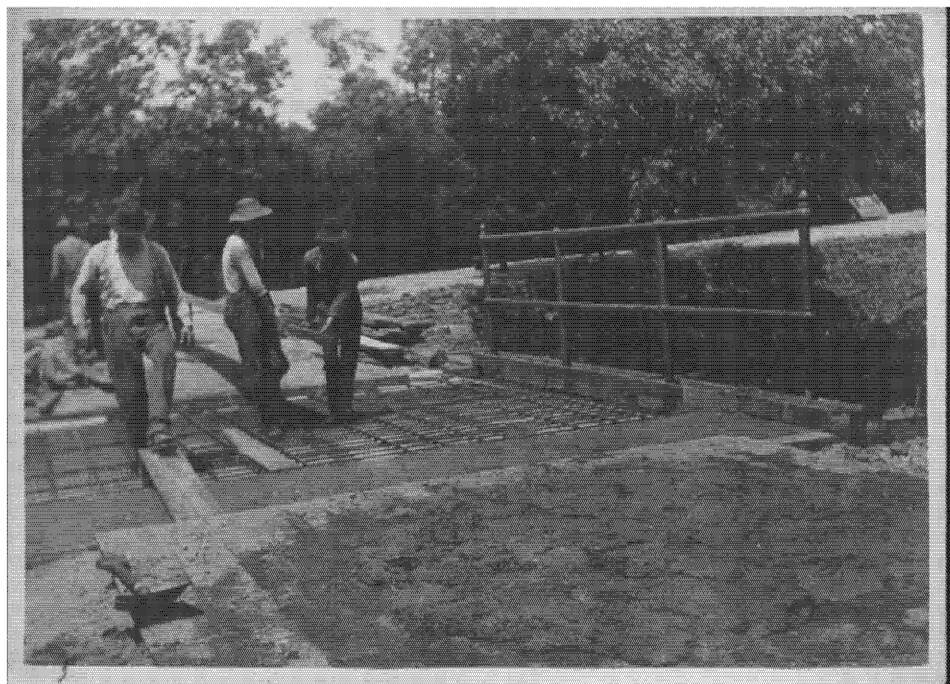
Gordon's Slough Bridge, 1907, showing Connecting Roadway in background.
